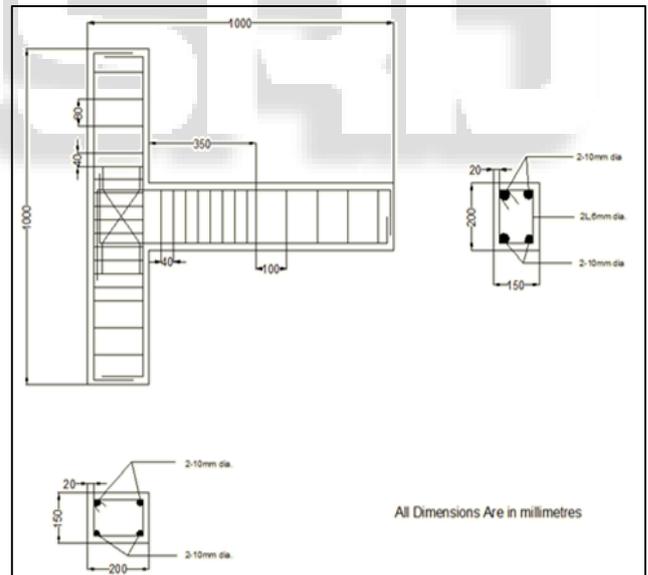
Reinforcement details as per I.S. 13920:1993 and diagonal cross inclined bar
